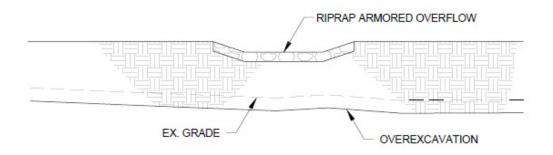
Typical Dam Diversion Extension Overflow Crest Section
